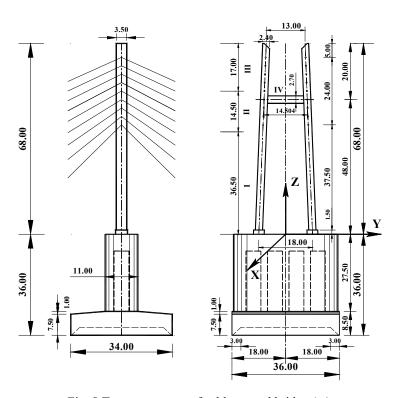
Tower structure of cable-stayed bridge (*m*)
